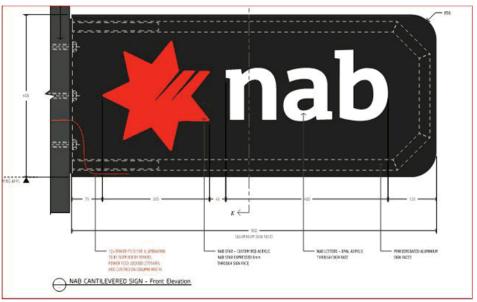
proposed horizontal wall sign to be attached to the Liverpool Street and Elizabeth Street Mall elevations
